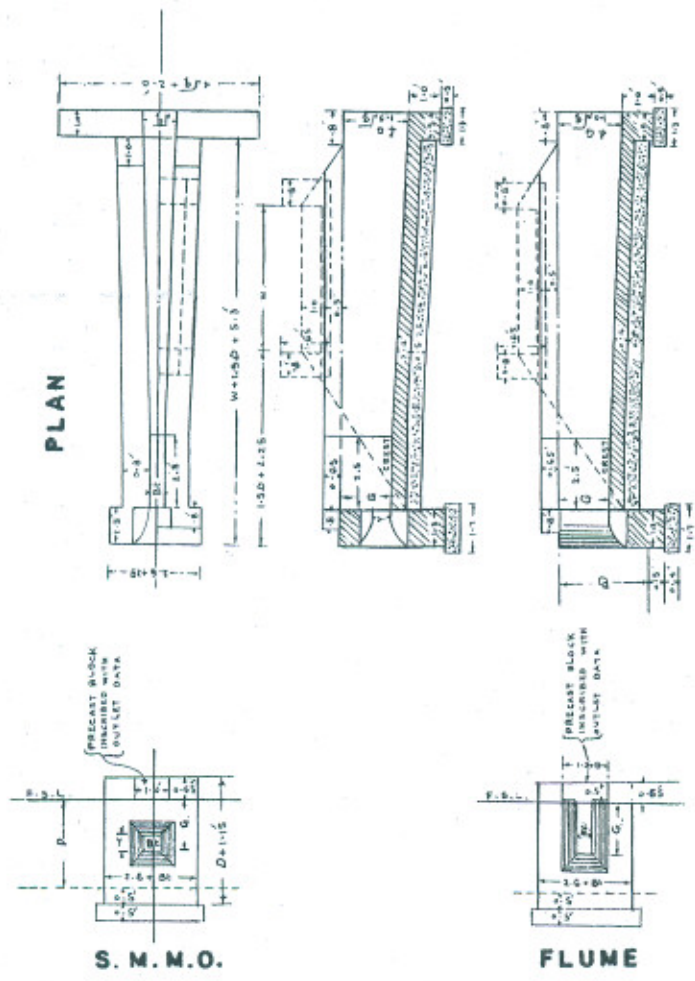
## DETAIL OF ROOF BLOCK & APPROACH IN BED
